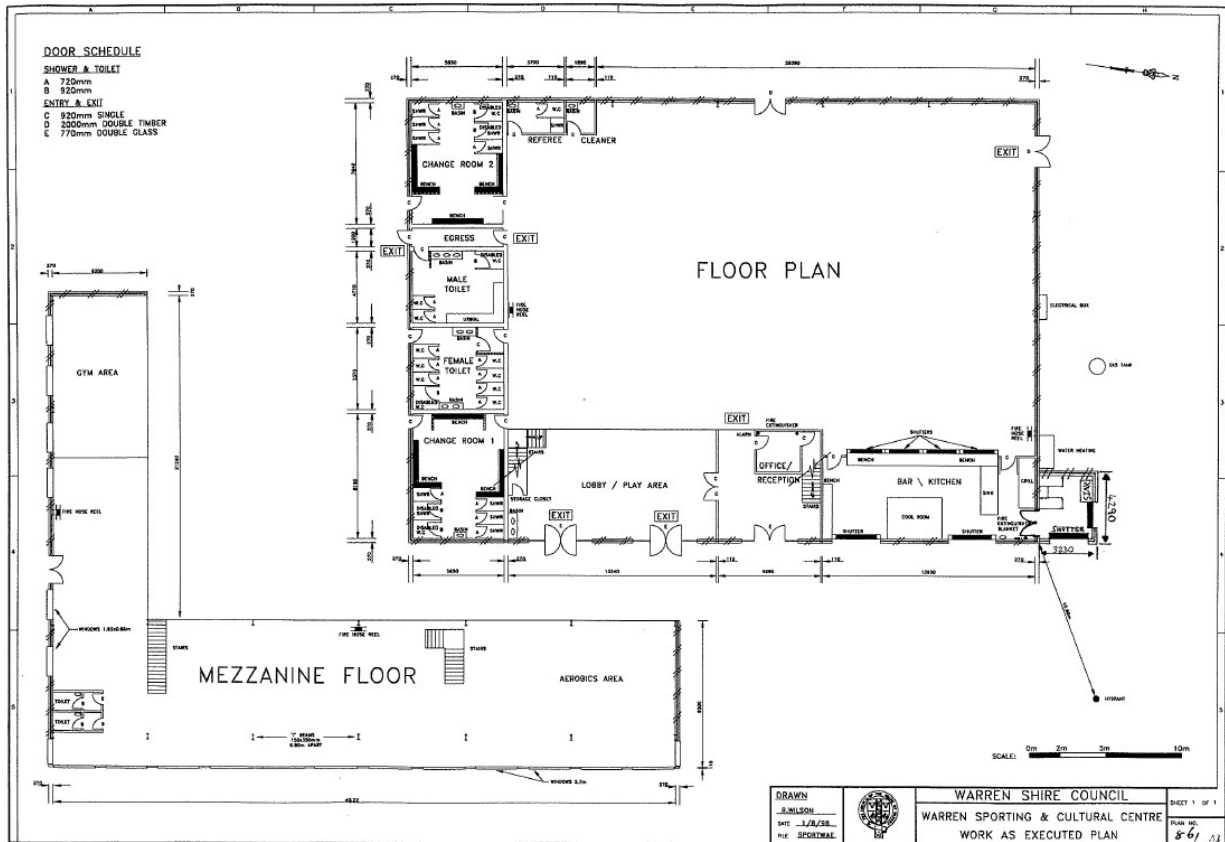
Warren Sporting & Cultural Centre Floor Plan (1998).
